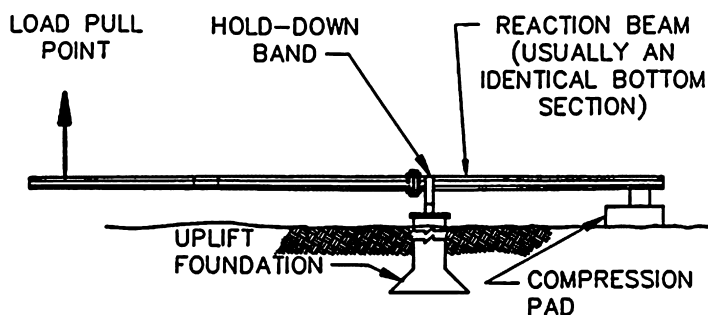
HORIZONTAL TEST SETUP.
